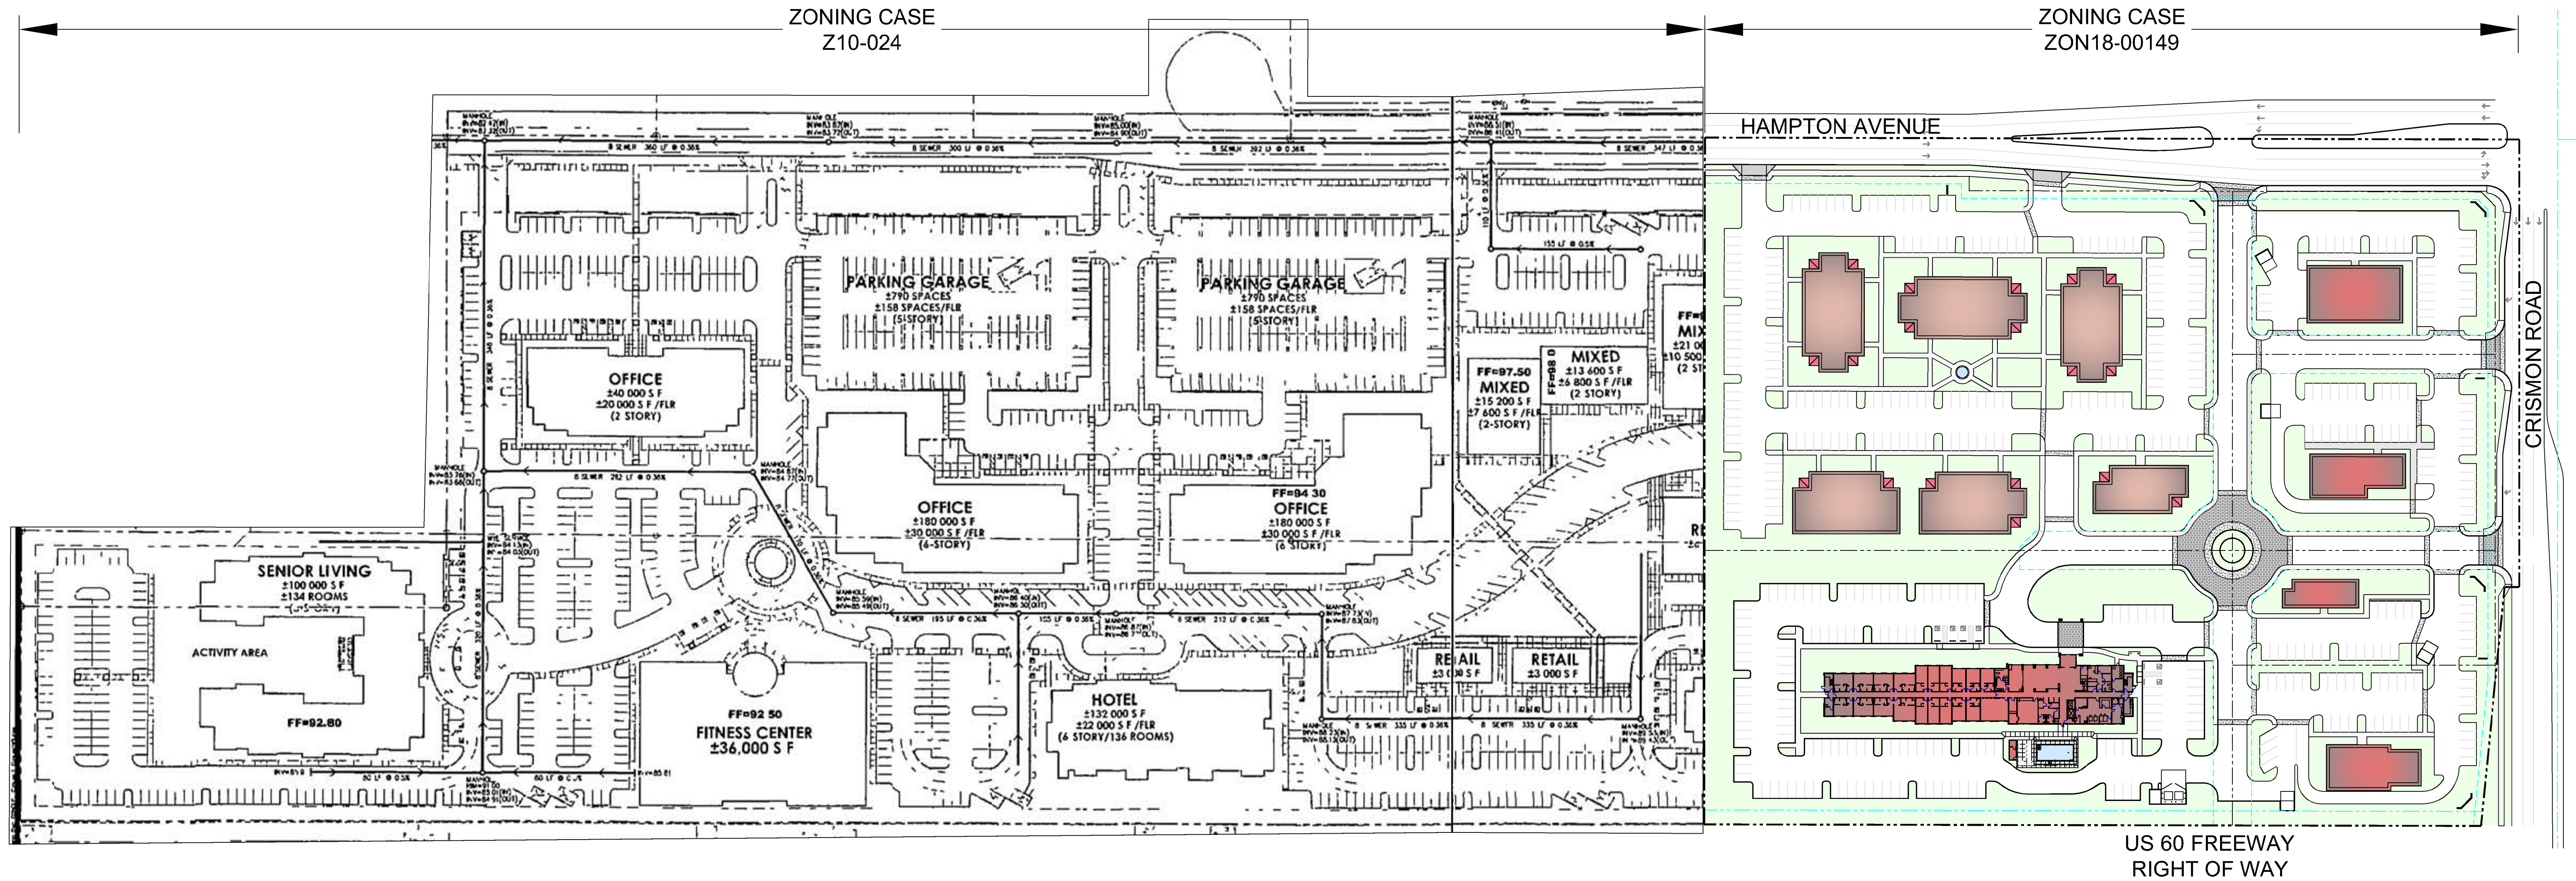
PRELIMINARY DEVELOPMENT SITE PLAN
